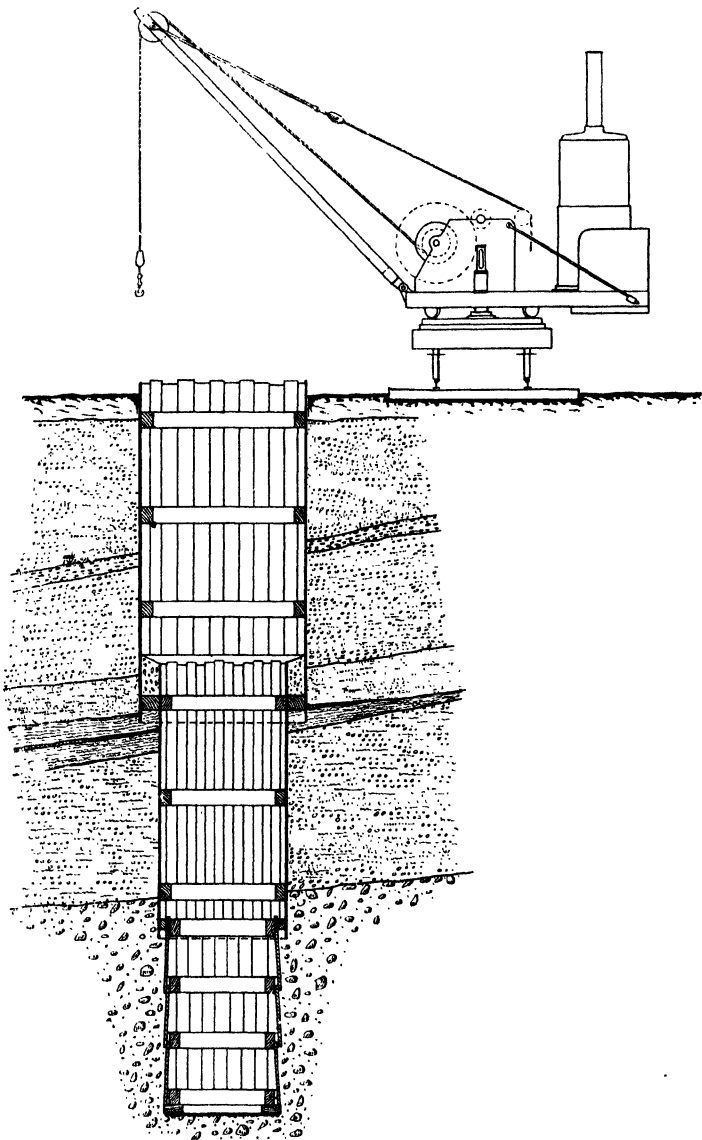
Test Pit, with Double Setting of Steel Piles, completed with Inclined Poling Boards.
